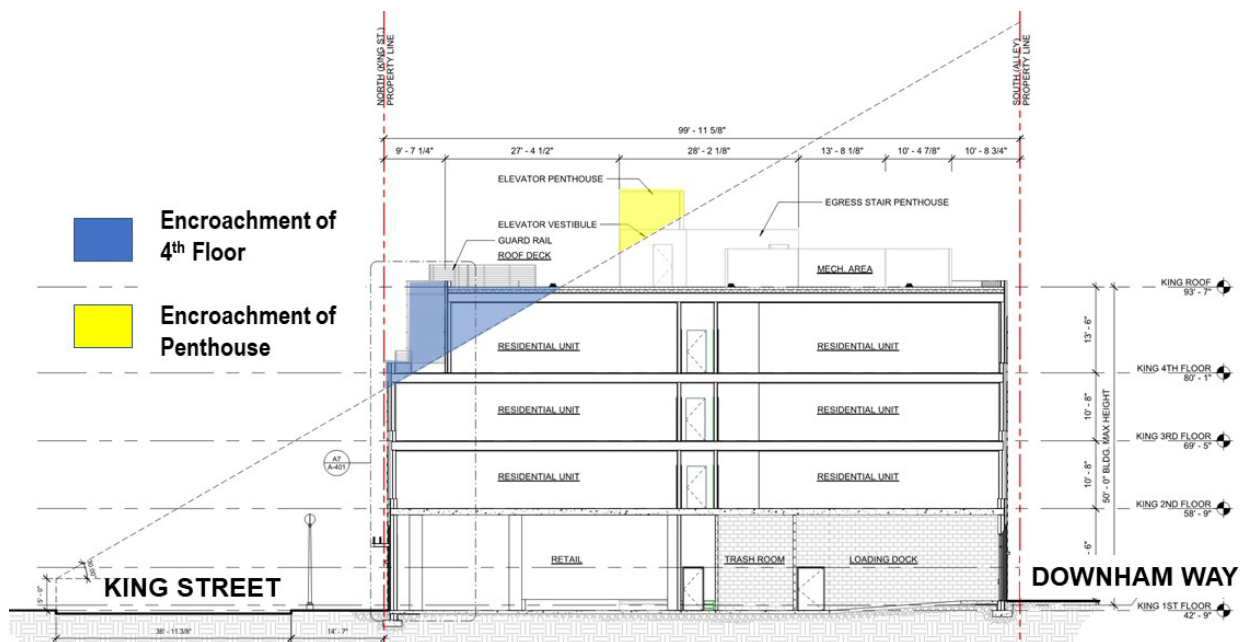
Portion (in blue) of the new building that does not comply with the recommended 30-degree building envelope starting from King Street.
